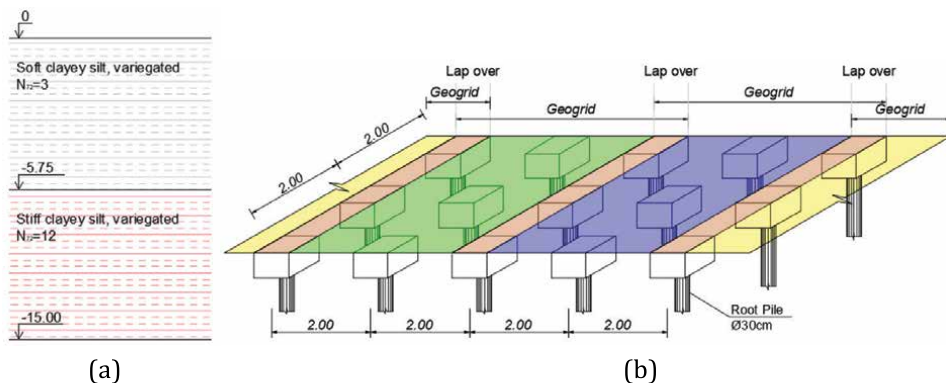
Reinforced piled embankment executed in the *várzea* region on the BR-319 federal highway, state of Amazonas. a) Stratigraphic profile; b) arrangement of the piles and the geogrid reinforcement, in cross-section.
